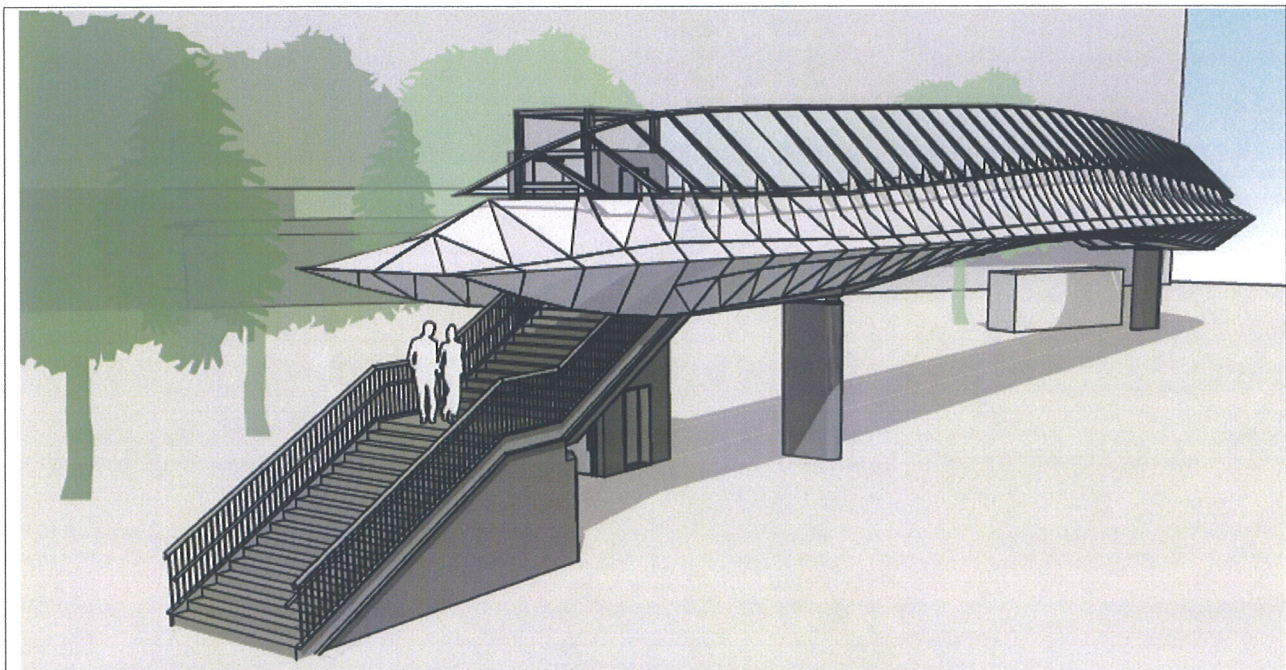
Proposed footbridge canopy design over stairway, (eastern end of footbridge)
